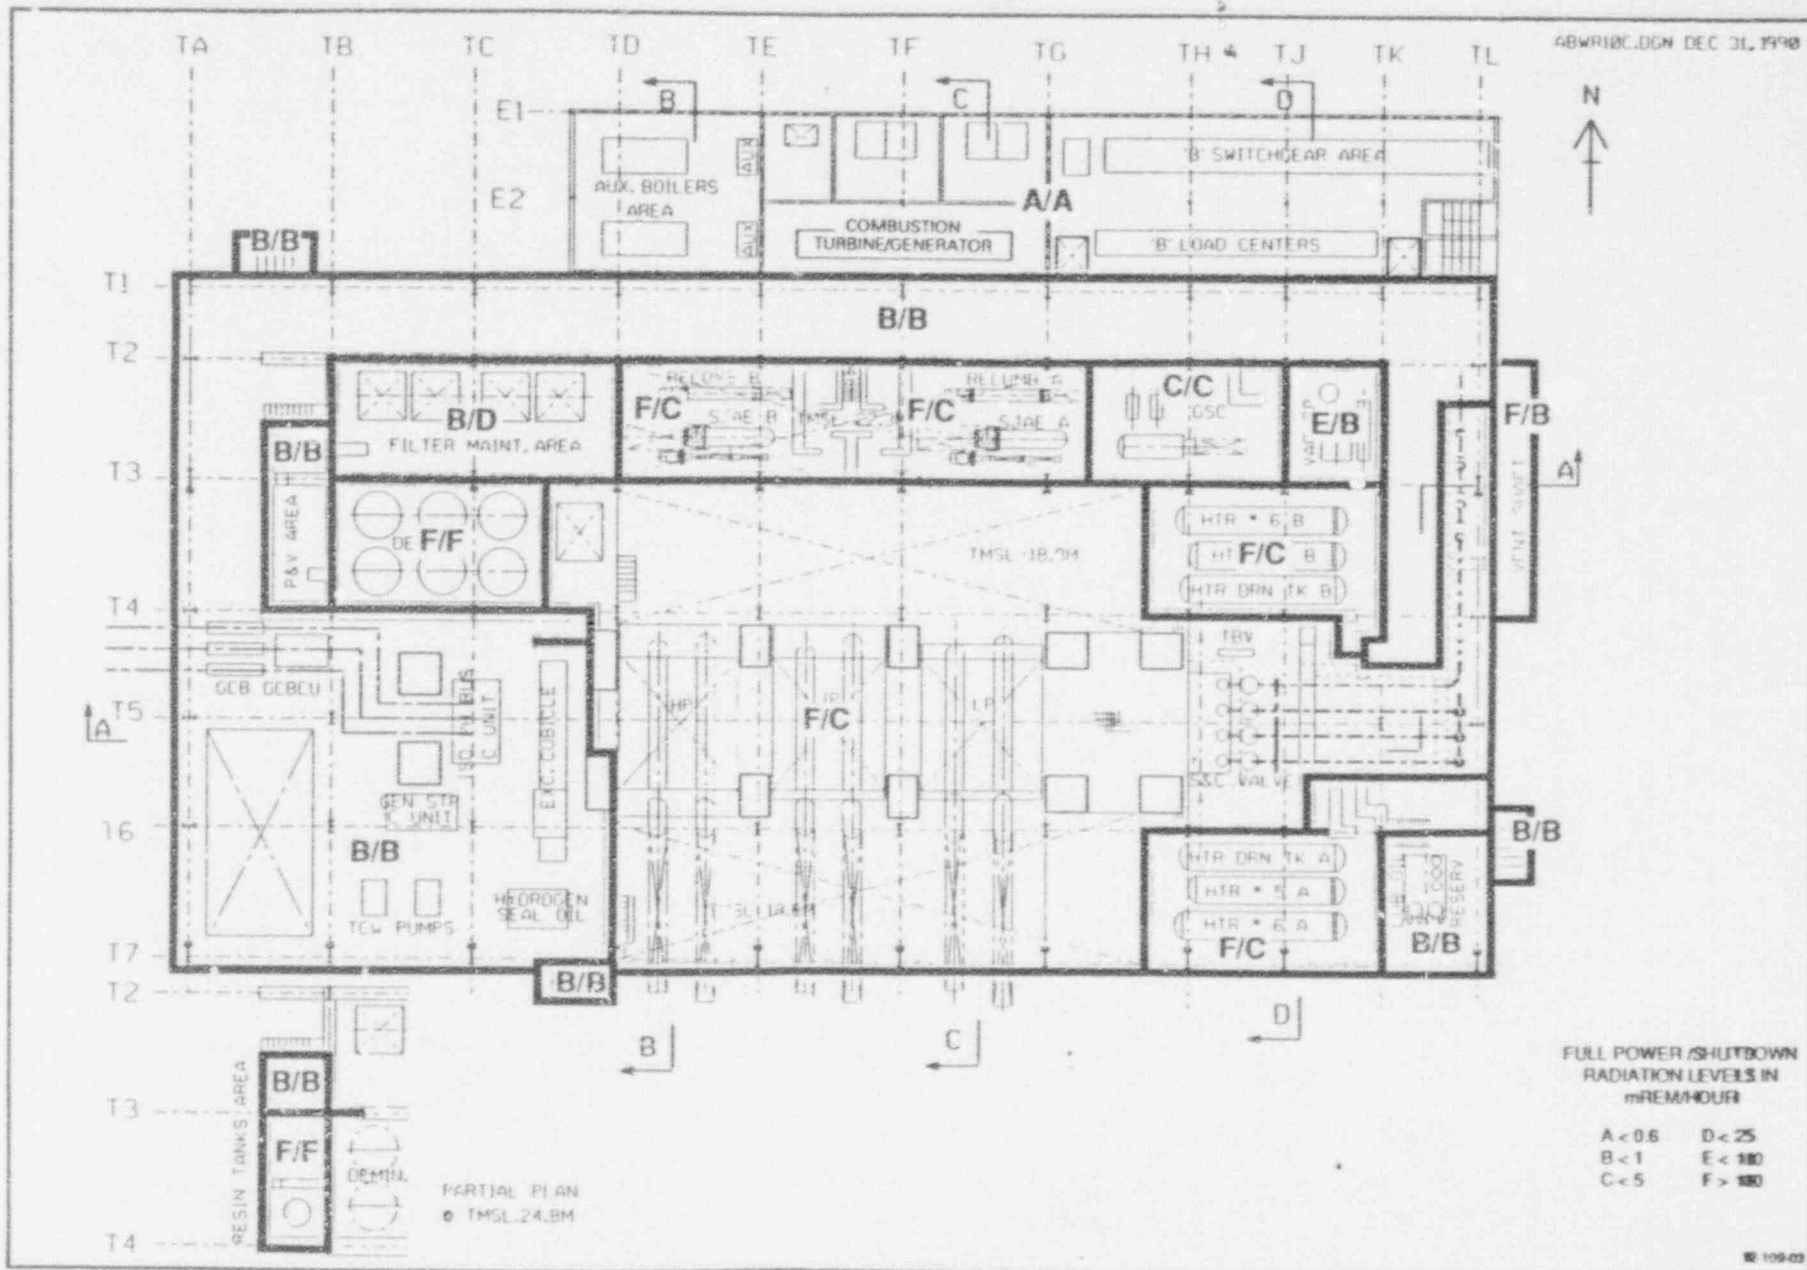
TURBINE BUILDING RADIATION ZONE AT ELEVATION TMSL 20.3M
